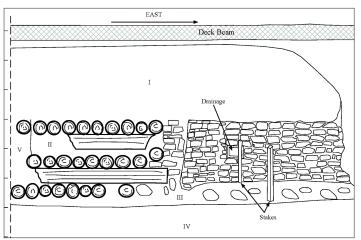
Field drawing of the north profile of the excavations near the head of Whitehall Slip. At left, log grillage; at right a stone retaining wall.
